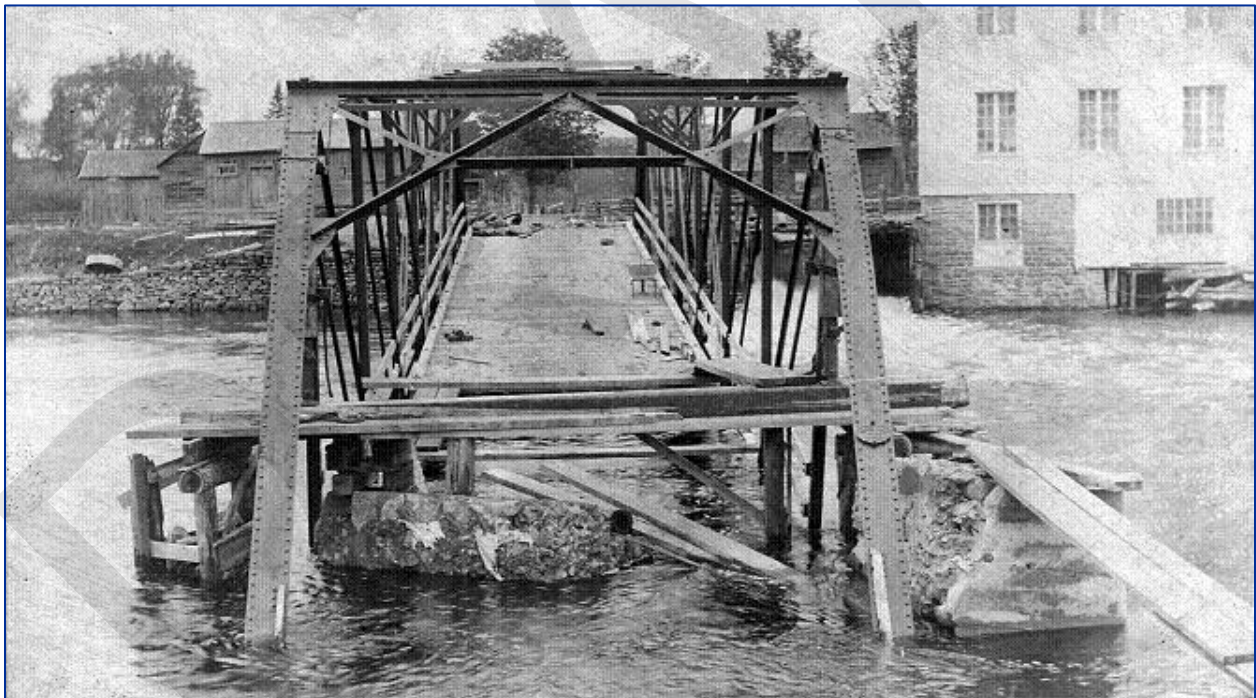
View of the damaged Andrewsville Bridge, 1904.<sup>121</sup>
